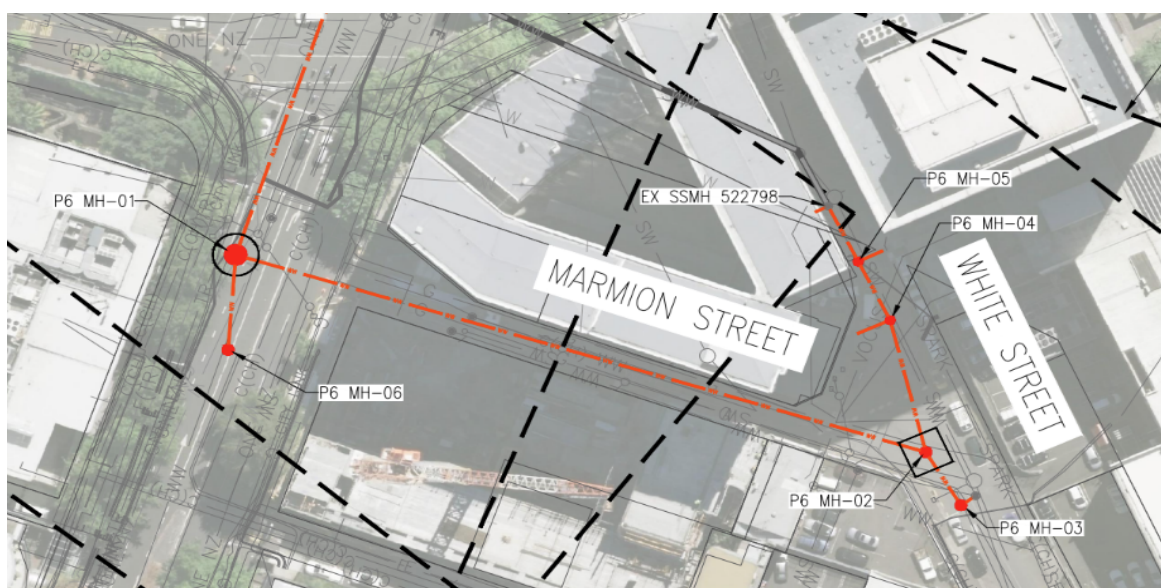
Overview of construction works for Part 6 alignment (preliminary plan)
